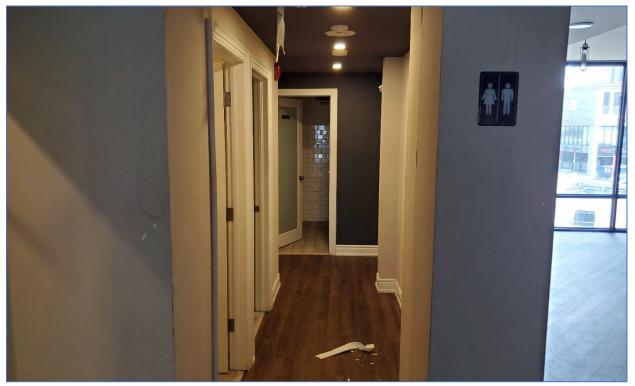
View northwest showing the "L" shaped hallway on the second storey
